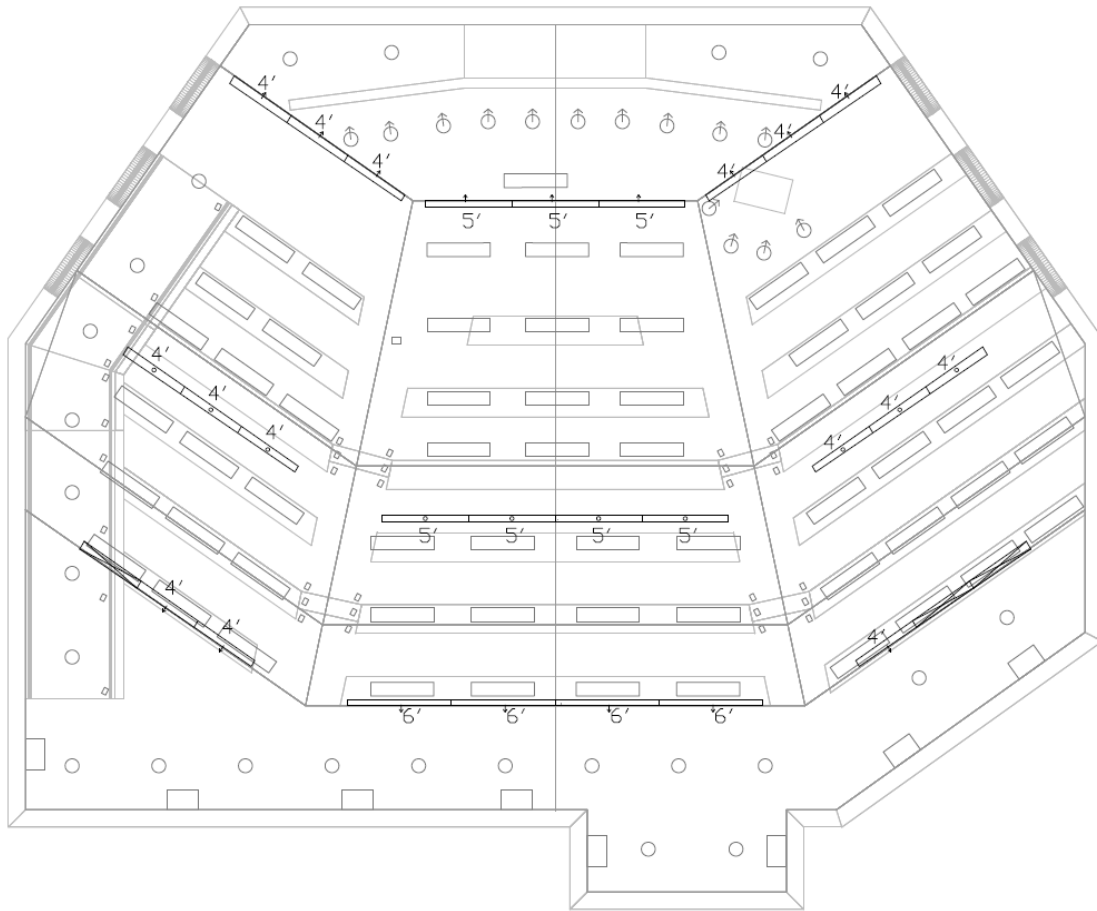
Lecture Hall Reflected Ceiling Plan – Diffusers and Lighting
